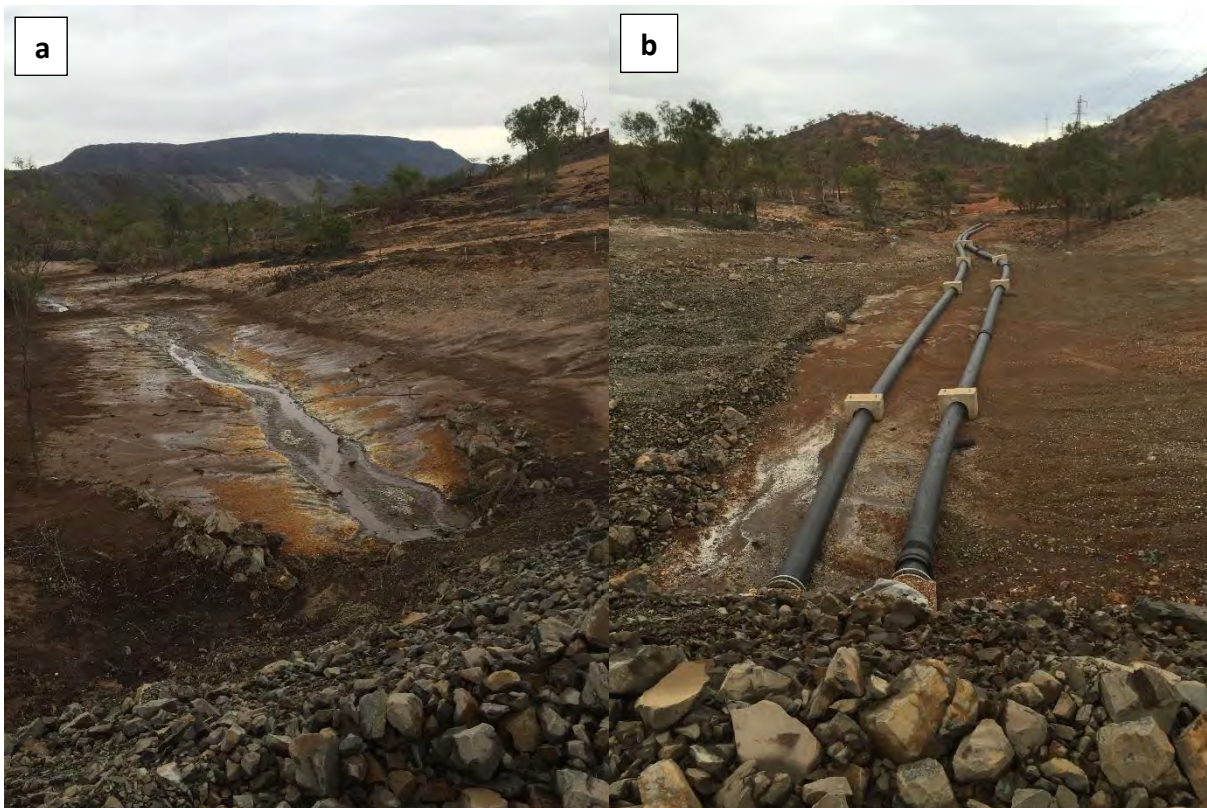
King Gully Dam. a) upstream facing south, with BSOC WRD in the background, b) downstream, facing north, where seepage is piped to KSOC (August, 2015)
